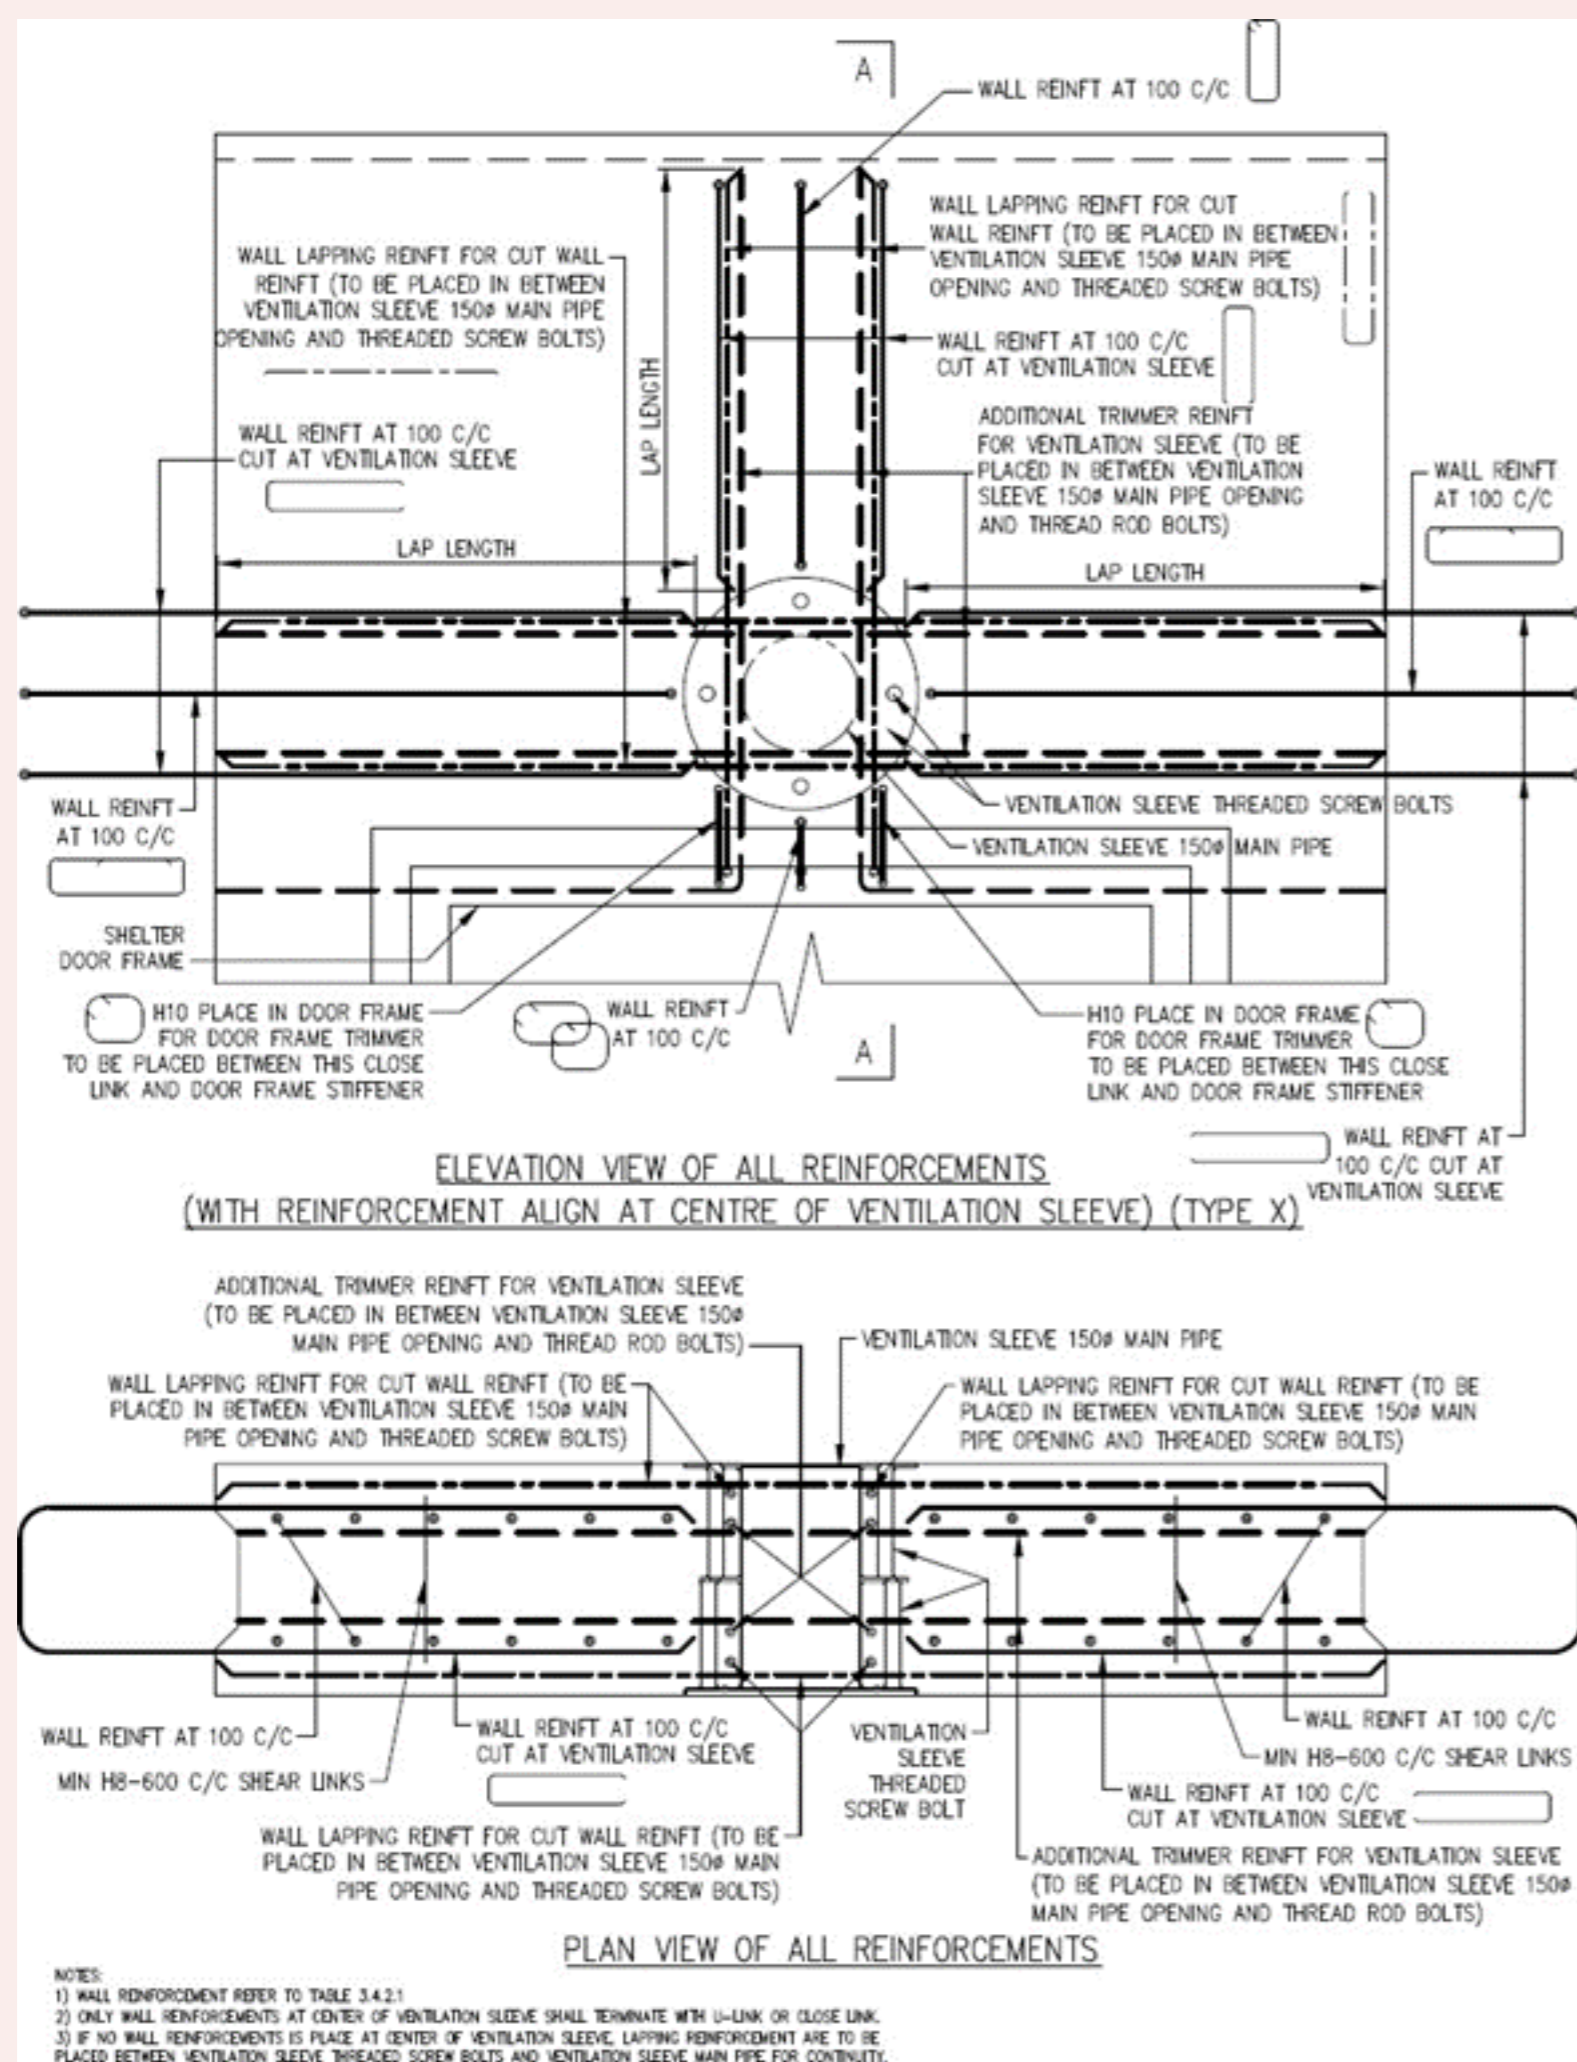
(o)(ii): TYPICAL DETAILS AND SECTIONS OF REINFORCEMENTS AT VENTILATION SLEEVE LOCATION
